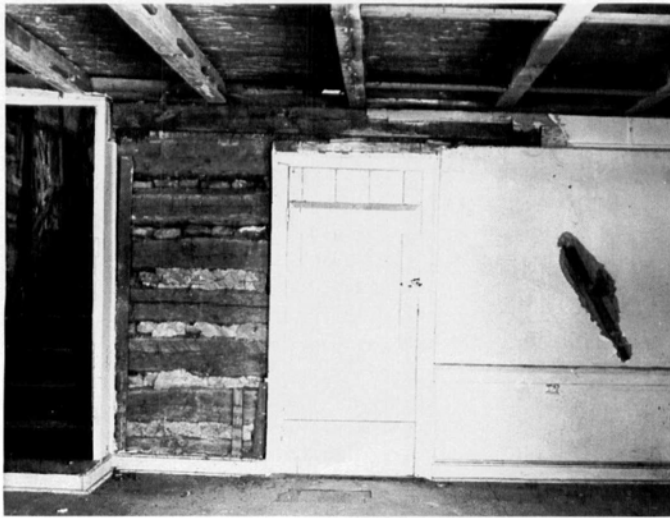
This photograph of the interior of a 1793 log house in Maryland reveals much about historic log building construction and interior finish treatments. To the left of the plank door plaster has been removed exposing the stone chinking and daubing; remnants of vertical furring strips attached to the logs show evidence of traditional horizontal lath, while the hole broken through the plaster wall on the right shows the use of diagonal lath. The open door reveals a very steep, enclosed stairway typical of many early log houses. Although plaster has been removed from the ceiling, the wall to the right of the door shows the original plaster finish and fine woodwork including beaded chair rail, floor and door molding. Photo: National Park Service Files.
